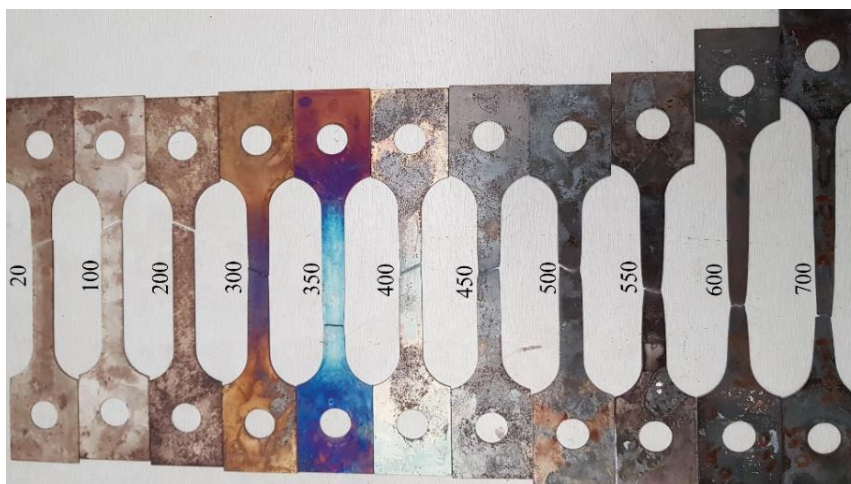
Fracture modes of tensile test coupons (G550-0.95 mm)
